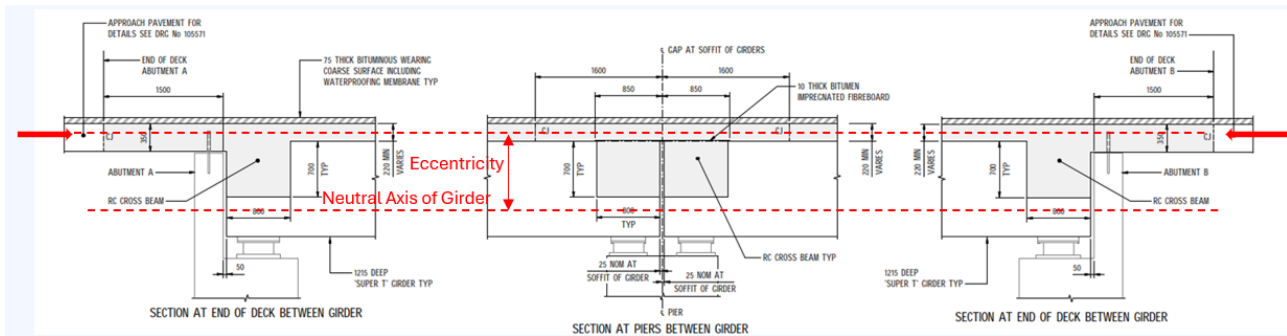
Eccentricity Effect Due to Seamless Pavement on Bridge Girders.
